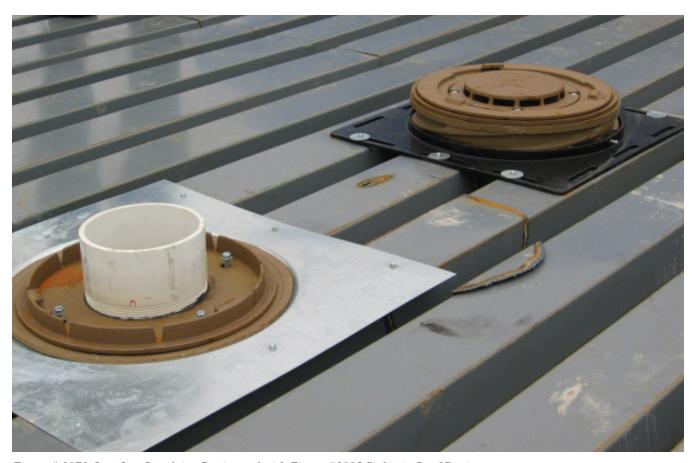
Overflow Standpipe Drain used with Figure #1005 Siphonic Roof Drain.
